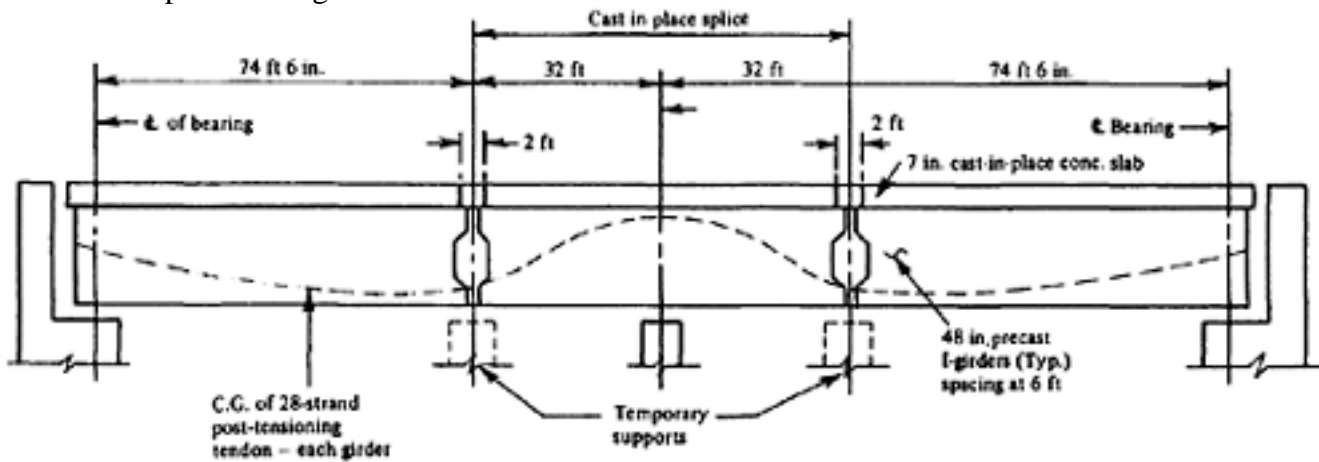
Prestressed segmental continuous girder (example 14.8.2)
